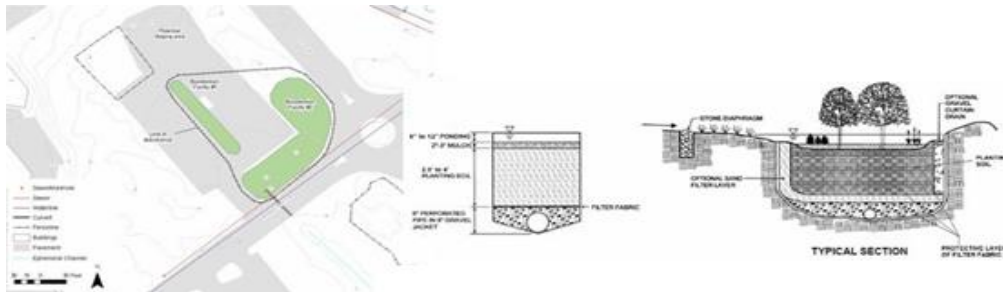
Plan view of the two bioretention facilities marked in green (left); Cross Section View of Typical Bioretention Facility (below).
